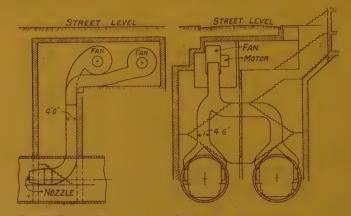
Longitudinal and cross sections, showing arrangement at Battery Park tunnels.
